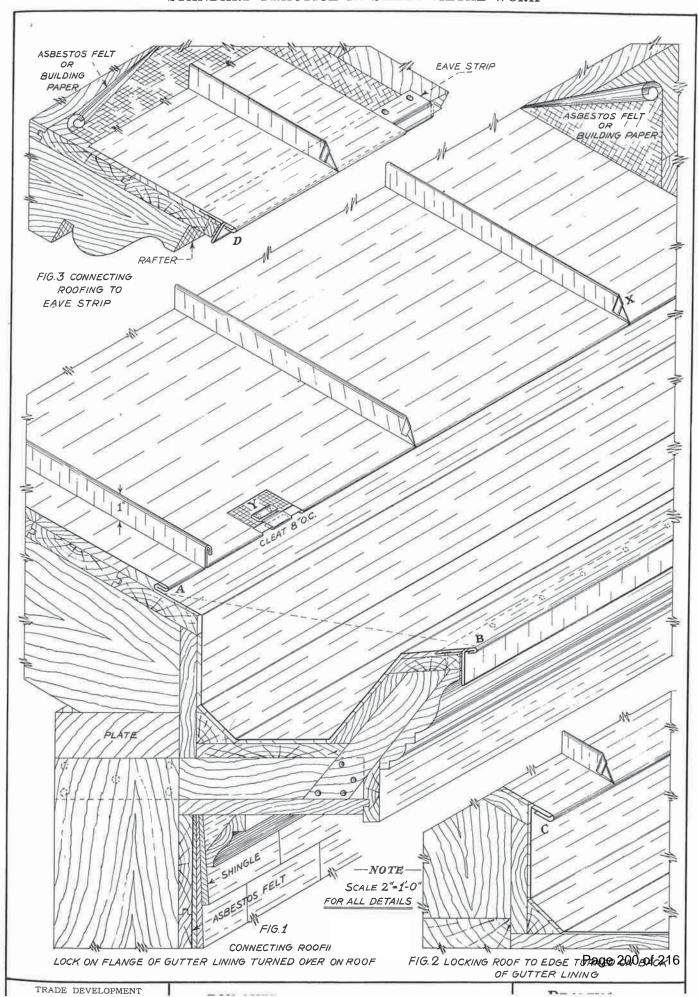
shows how connections are made between the gutter lining and batten roof, providing for horizontal expansion and contraction of the sheets between the battens.
